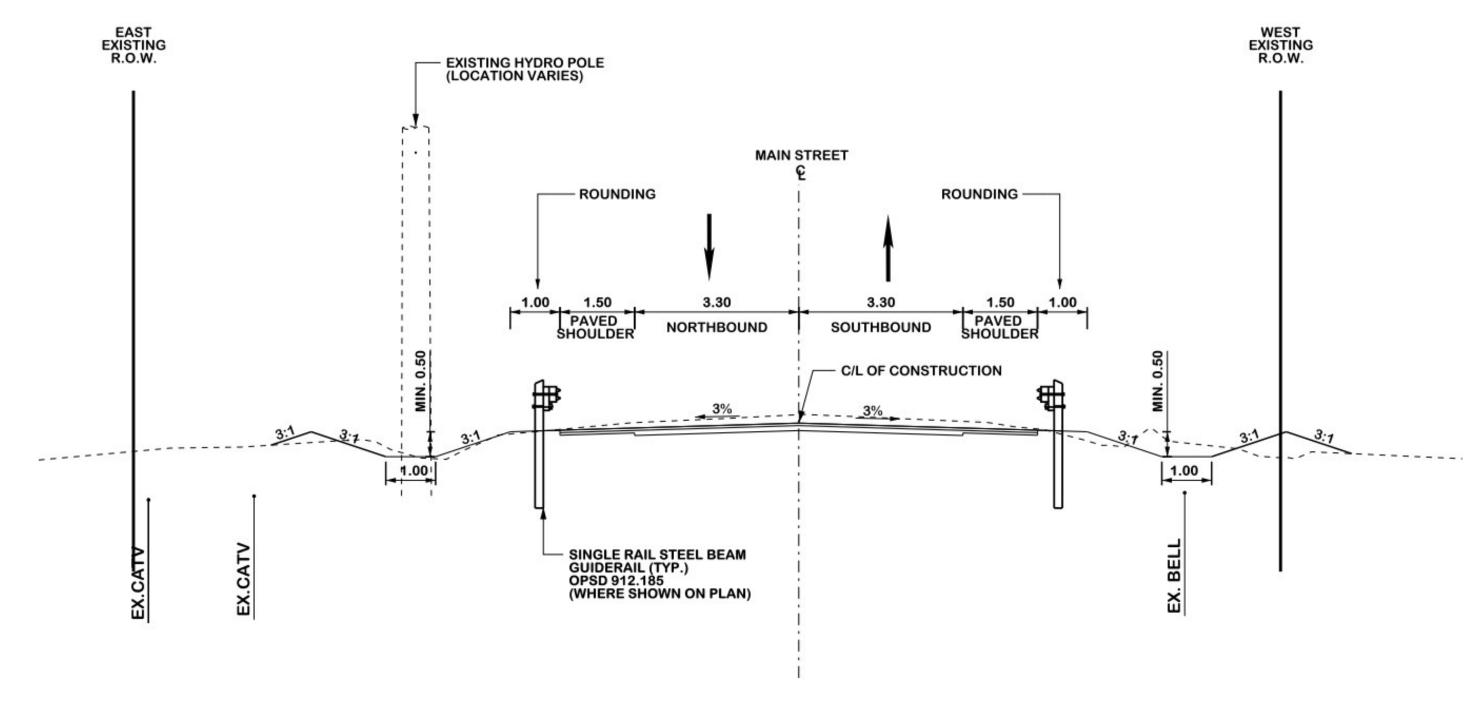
Typical Section (Main Street Rural Section Preferred Design Concept)
